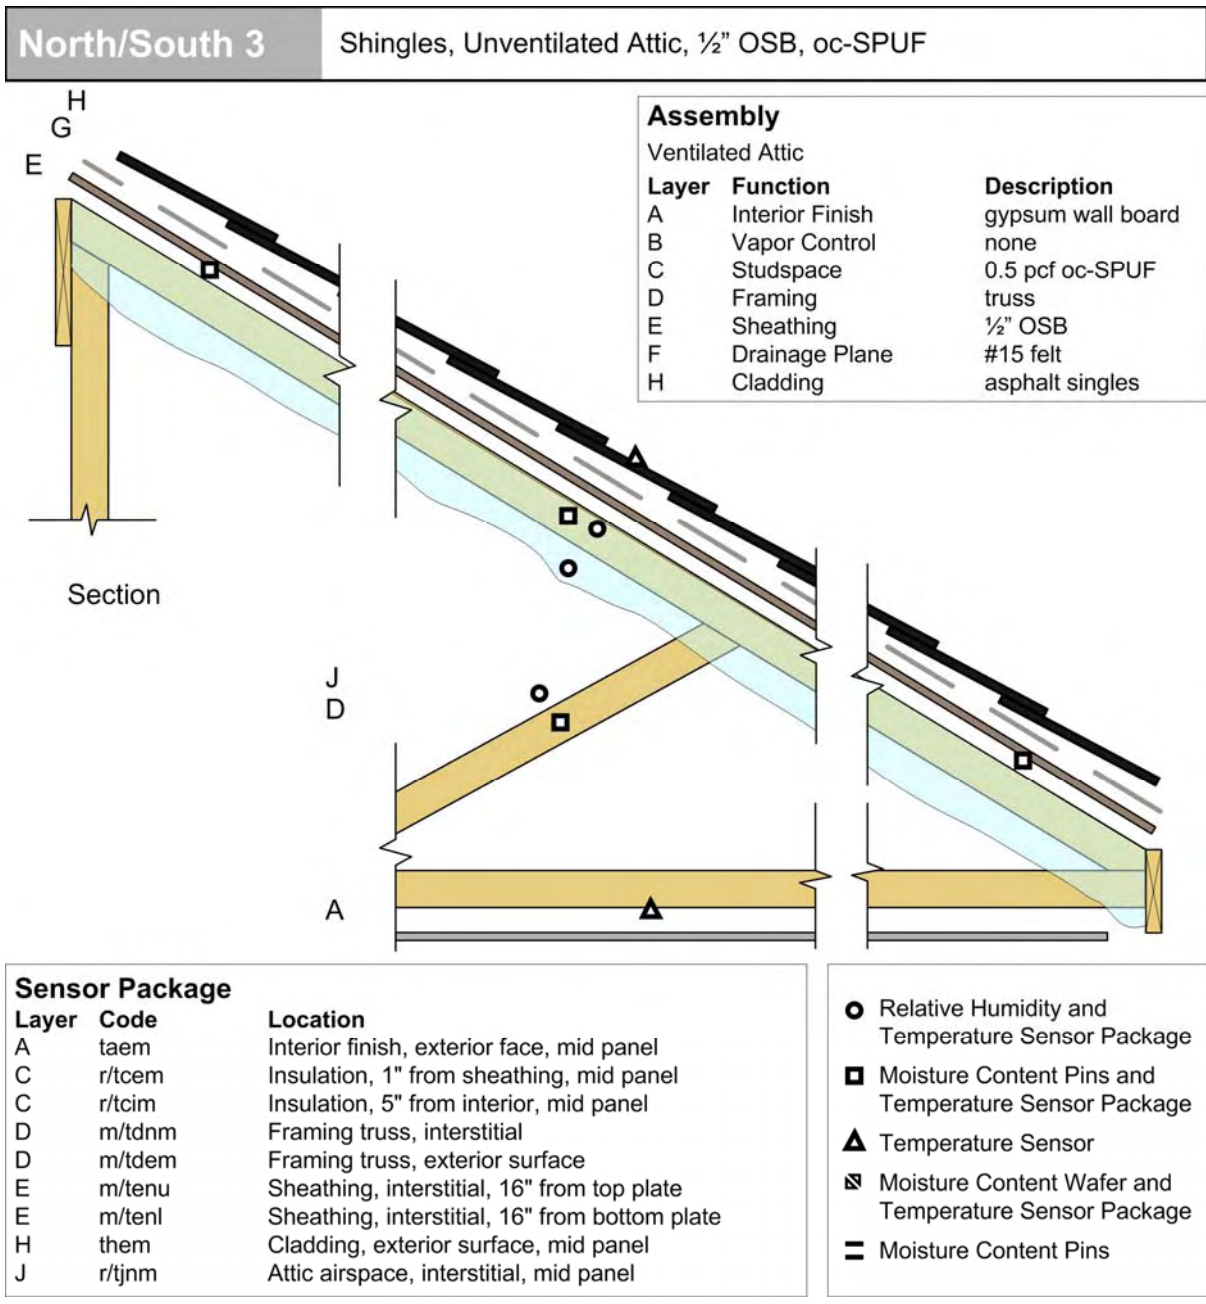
Test Roof 3: UCA with plain foam, construction and sensor layout
